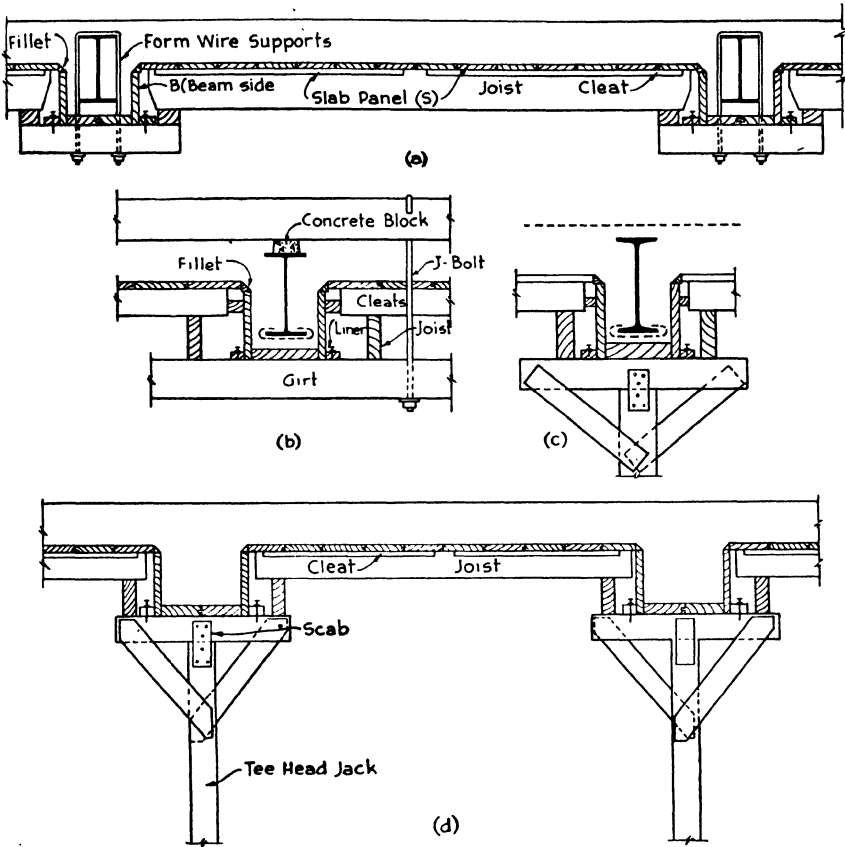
Forming Concrete Slabs. (a) & (b) suspended form, steel frame; (c) jack supported forms, steel frame; (d) jack supported forms, concrete frame.
